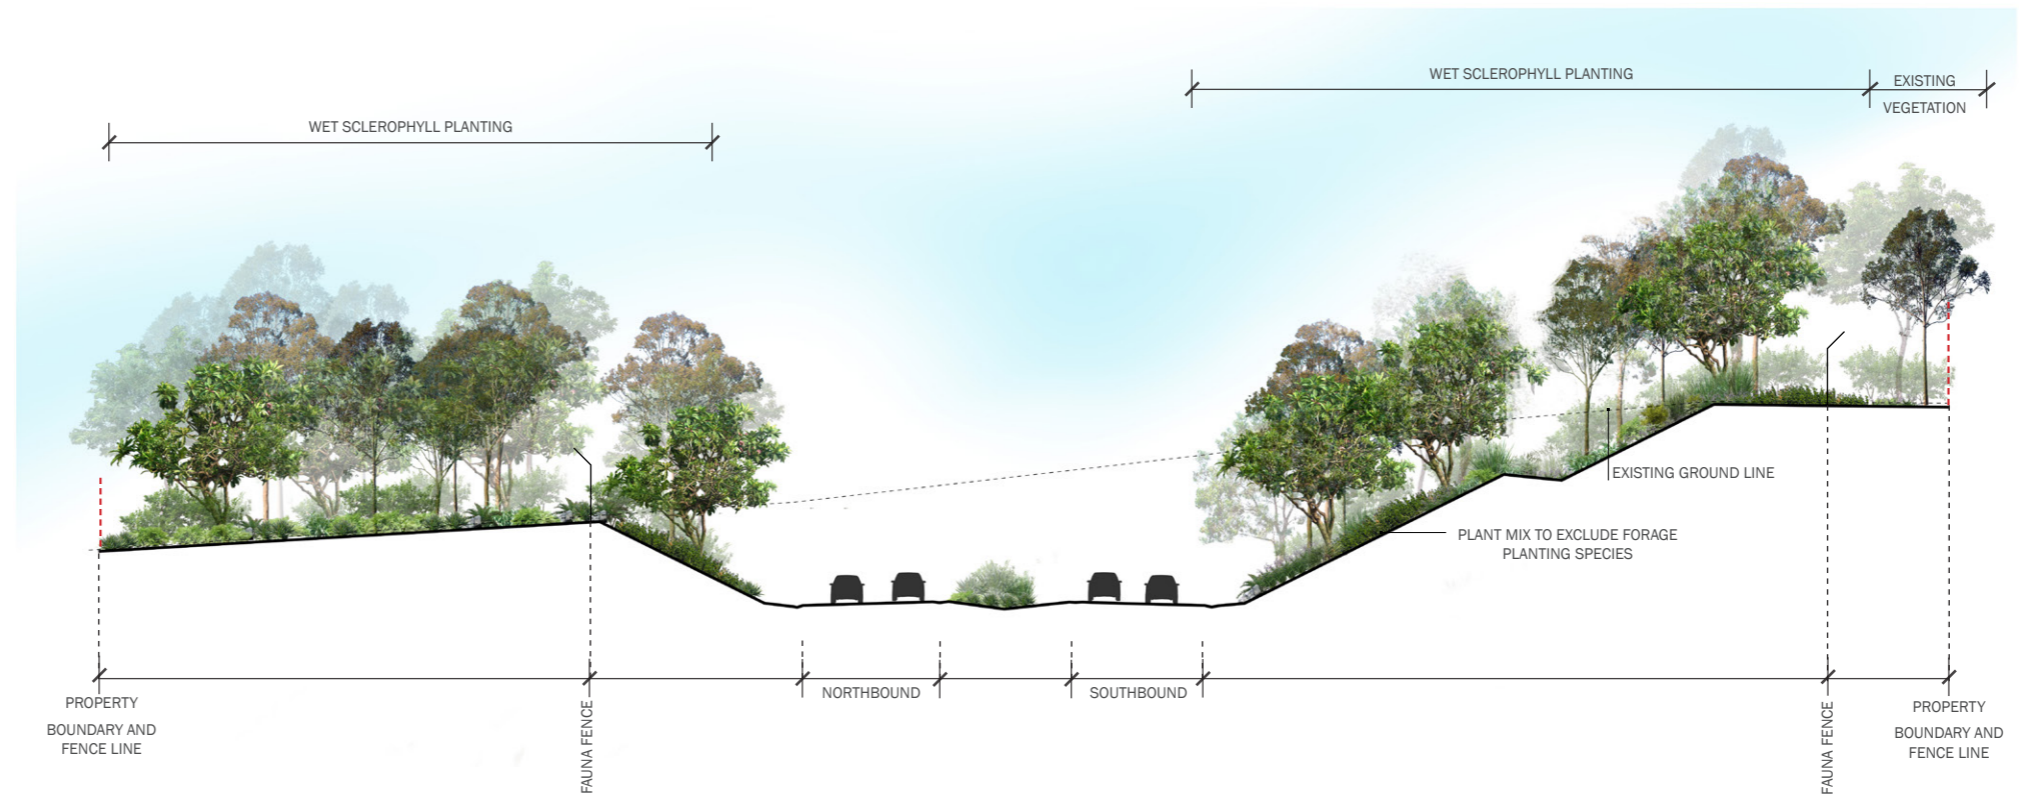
Cross section B-B in Bagotville (Scale 1:400) Note: Fence locations and types are to be confirmed, and subject to further design development
